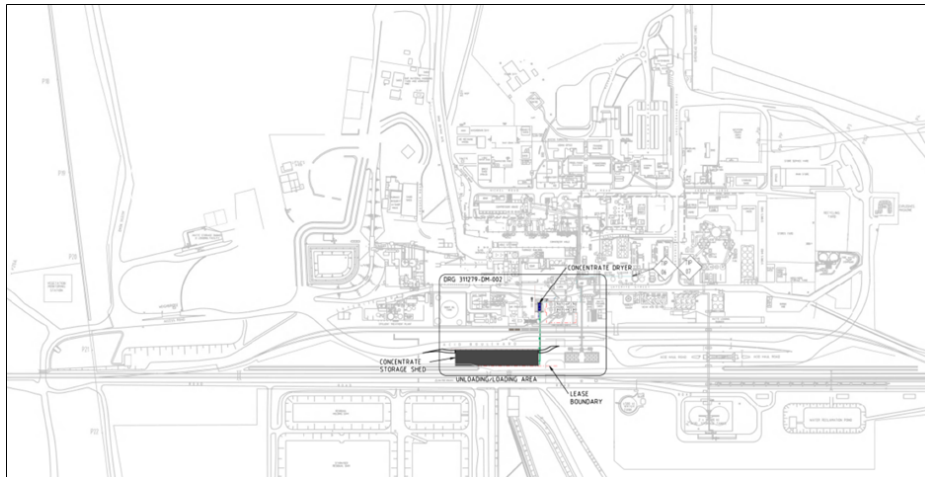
Site Plan – The concentrate dryer and conveying system are highlighted.
